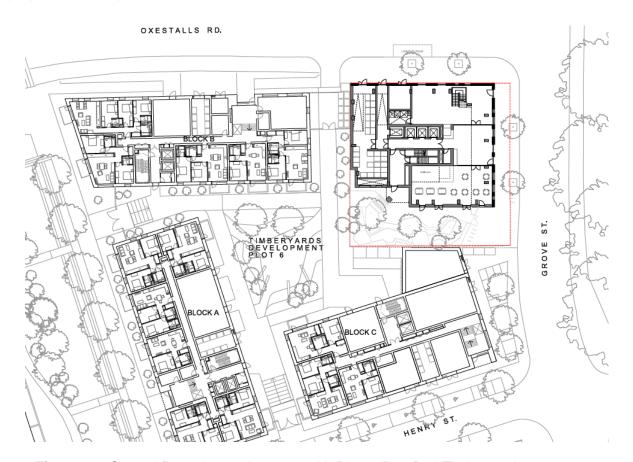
Ground floor plan and context with Plot 6, Deptford Timberyard.
